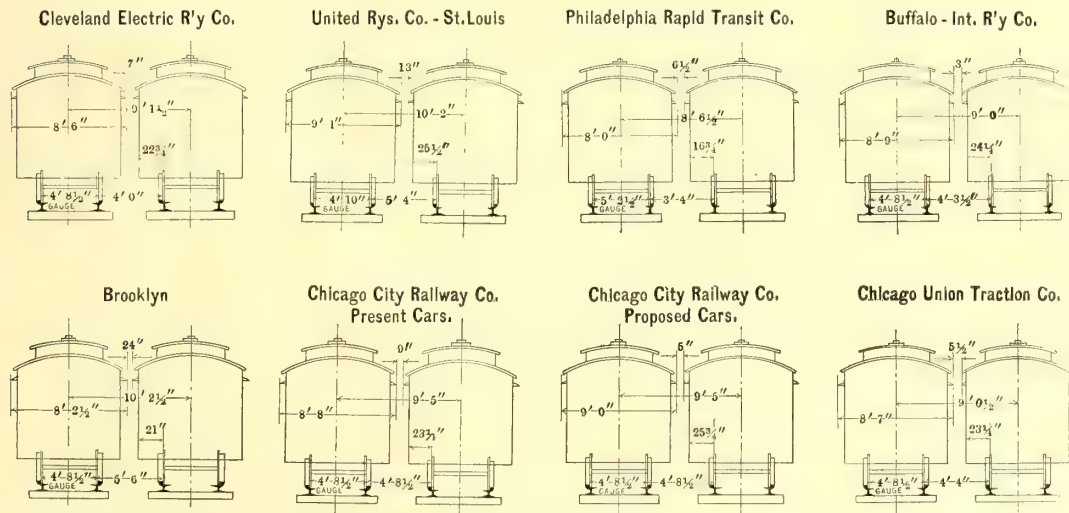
CONVENTIONAL DRAWING, SHOWING DIMENSIONS OF CARS AND CLEARANCES ON DIFFERENT ROADS
